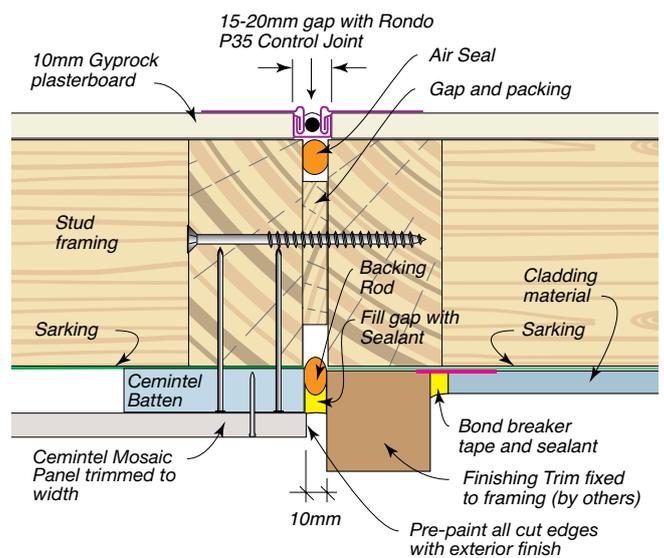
Junction of Mosaic Cladding System with Alternative Fibre Cement Cladding – Plan View
